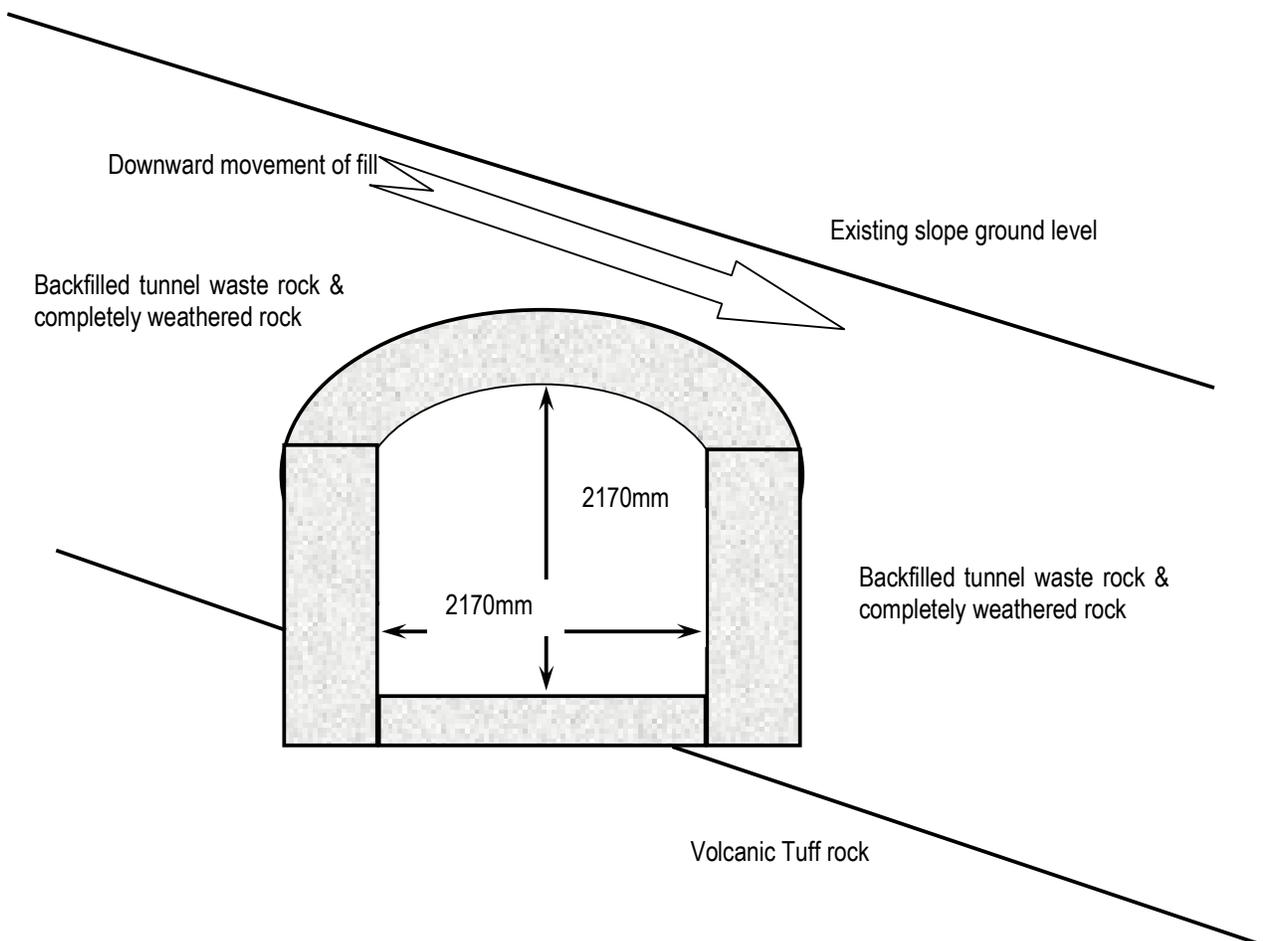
Typical cross section through mass concrete conduit at Nab Scar
